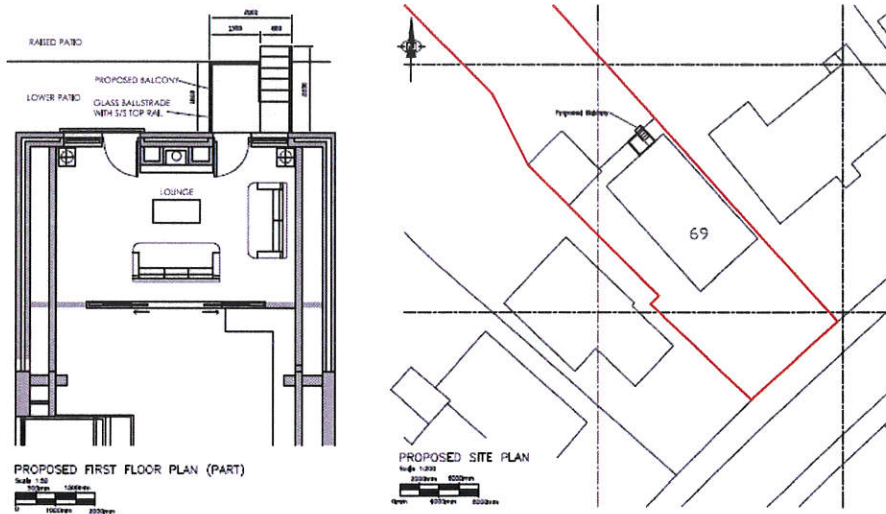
extract from approved drawing No: TS9185/01 Rev A, received on 6th September 2022 pursuant to planning application 10/22/0885 – proposed floor plan and site plan
